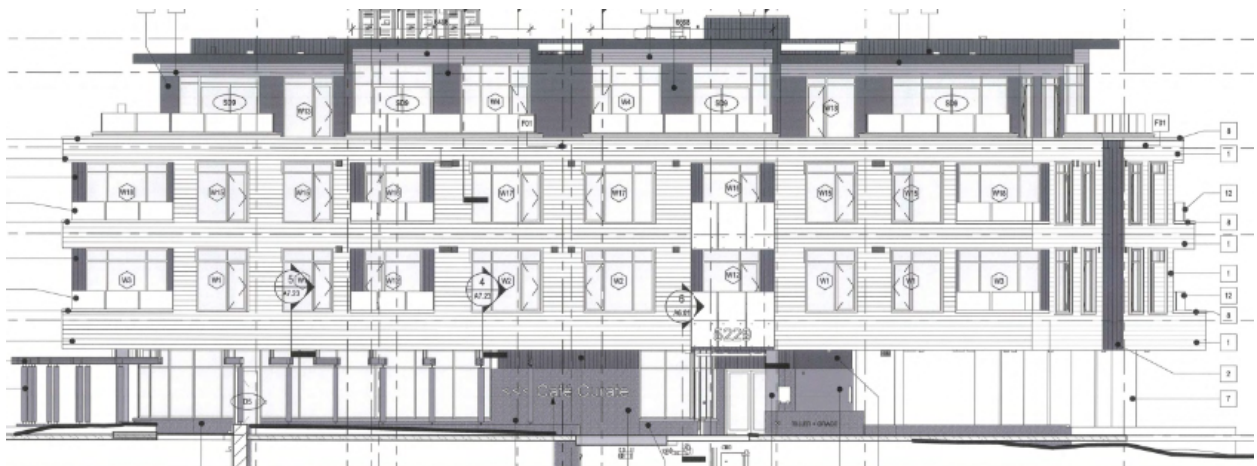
Approved west elevation (DPA01035) – Cordova Bay Road frontage.
